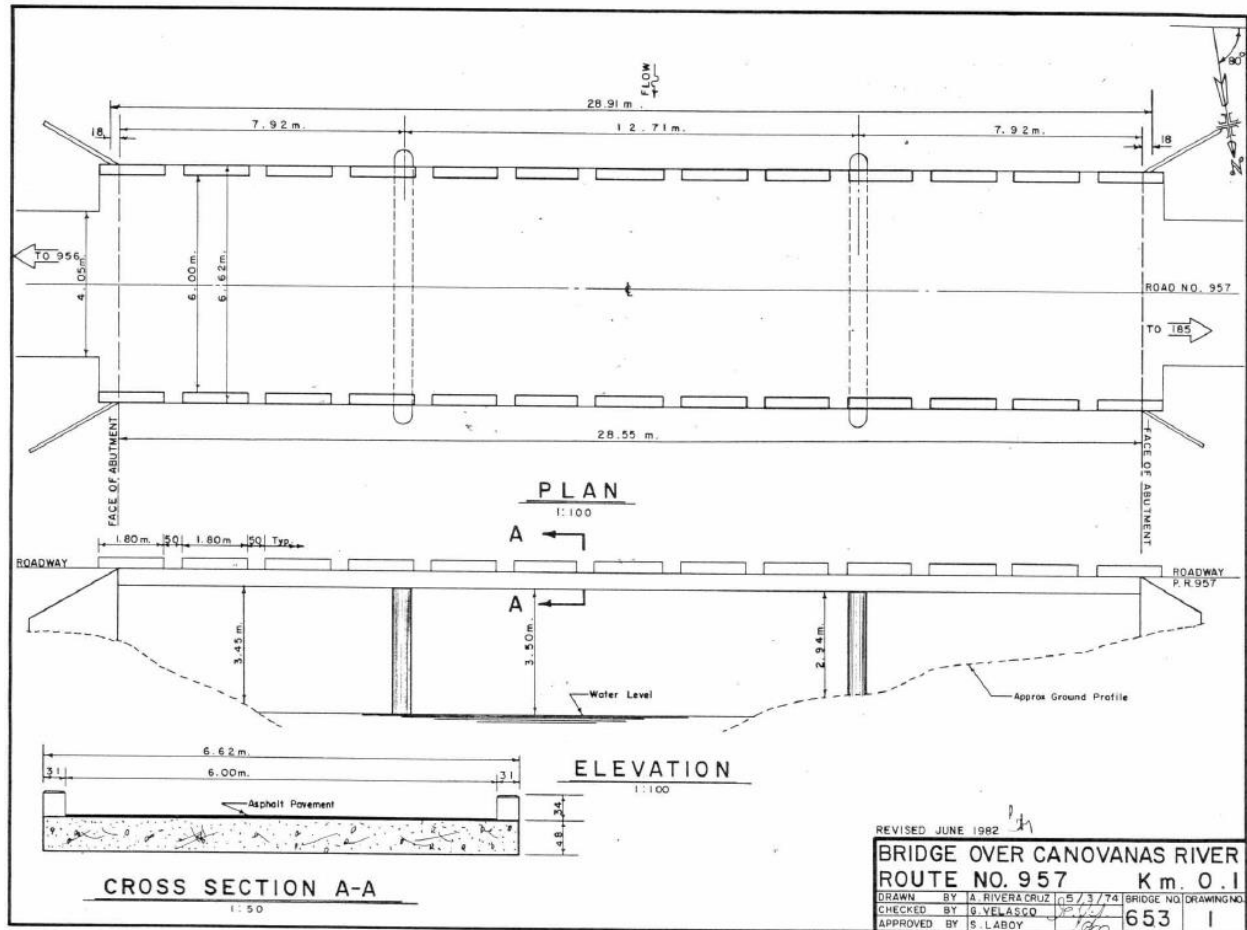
Bridge 653 drawings (source: PRHTA)
